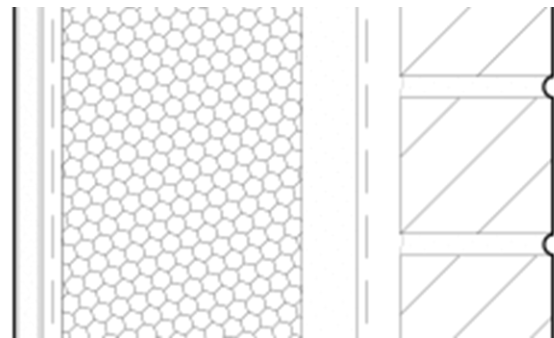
Case 6 with Steel Studs (Not Shown) (Source: Twiddy, 2011)
